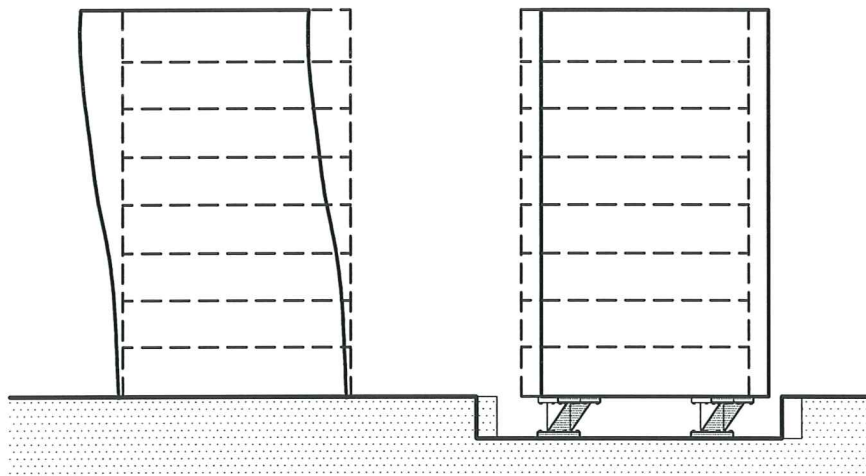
(a) Fixed base building; (b) base isolated building.
